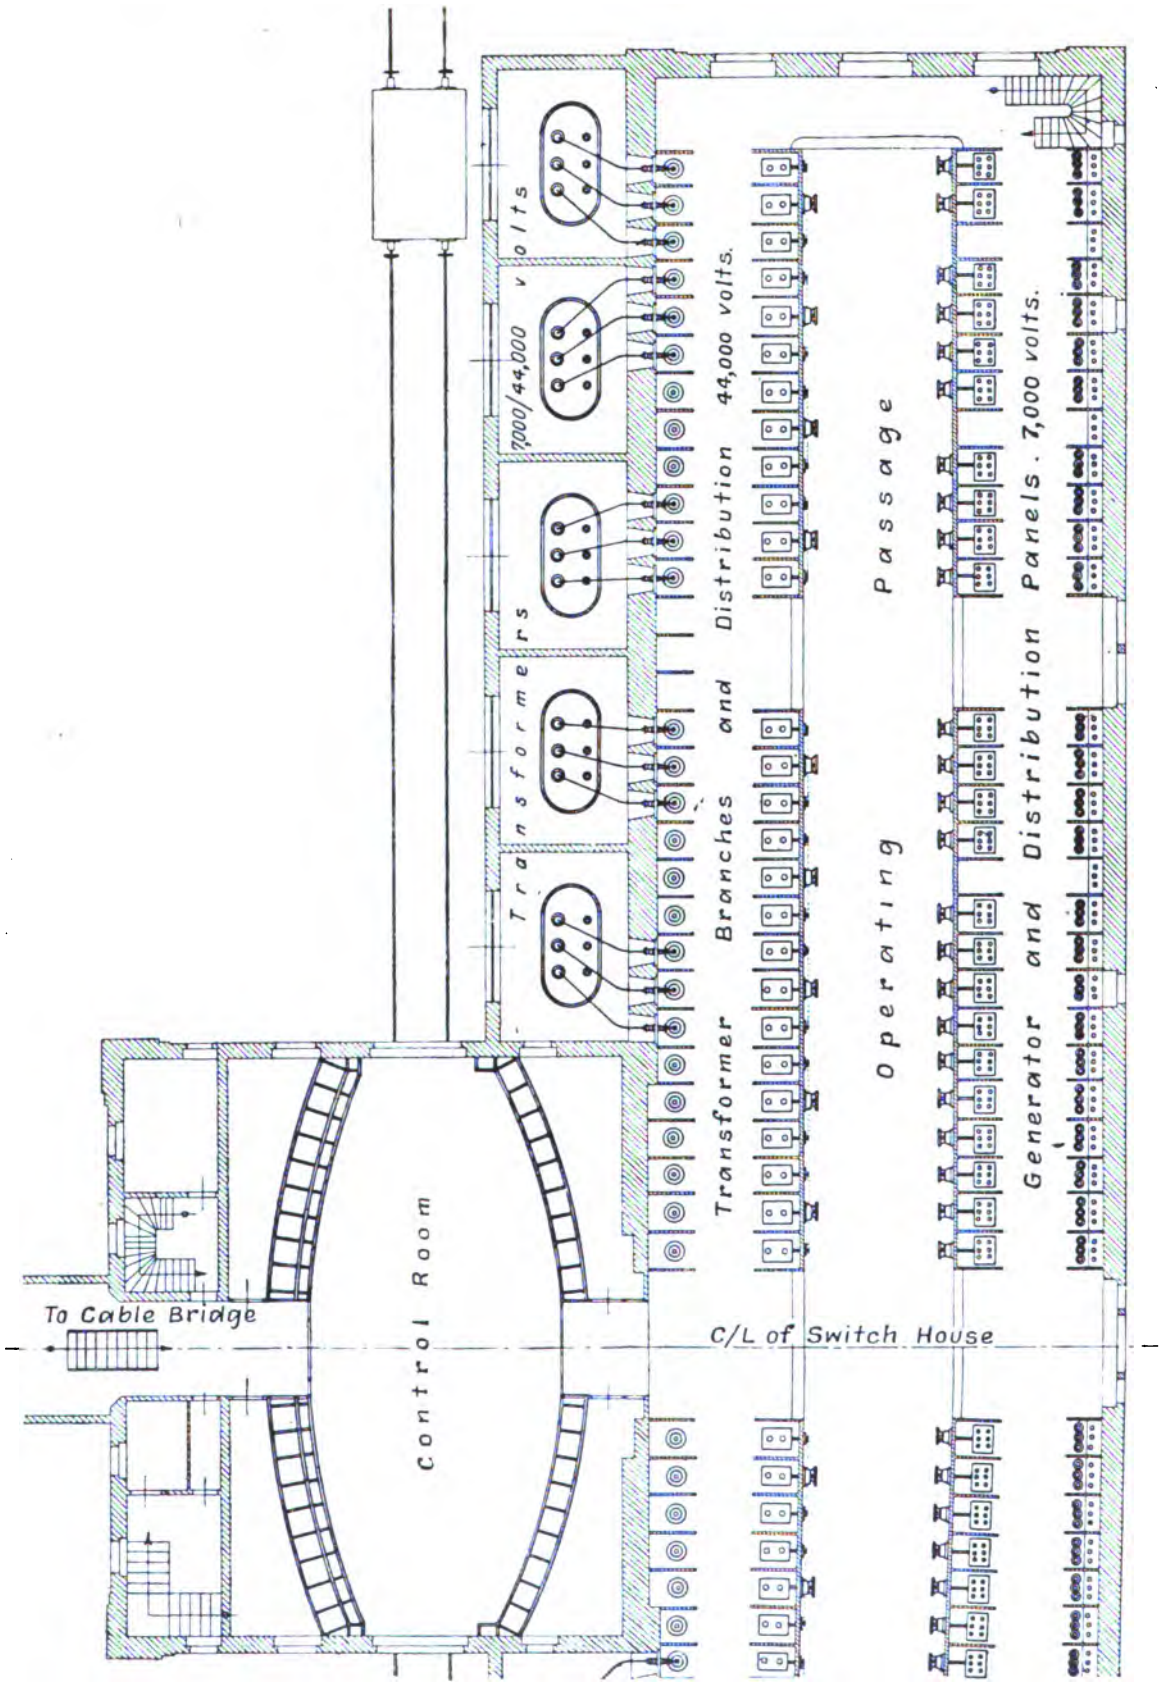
Plan of Switch House in the Wyhlen Electricity Works.
